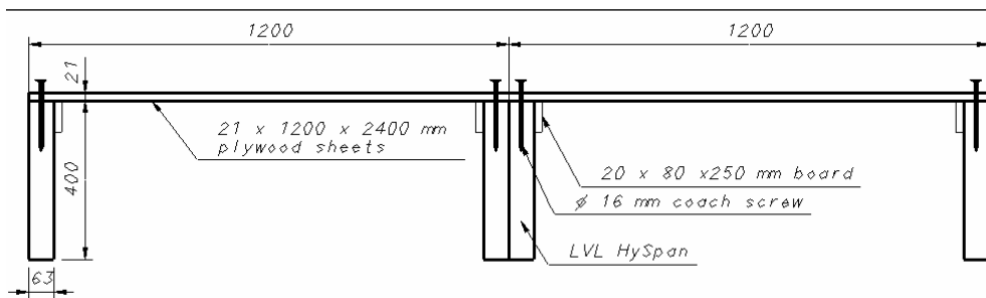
semi-prefabricated "M" section panel (dimensions in mm) (after Buchanan et al. 2008)
